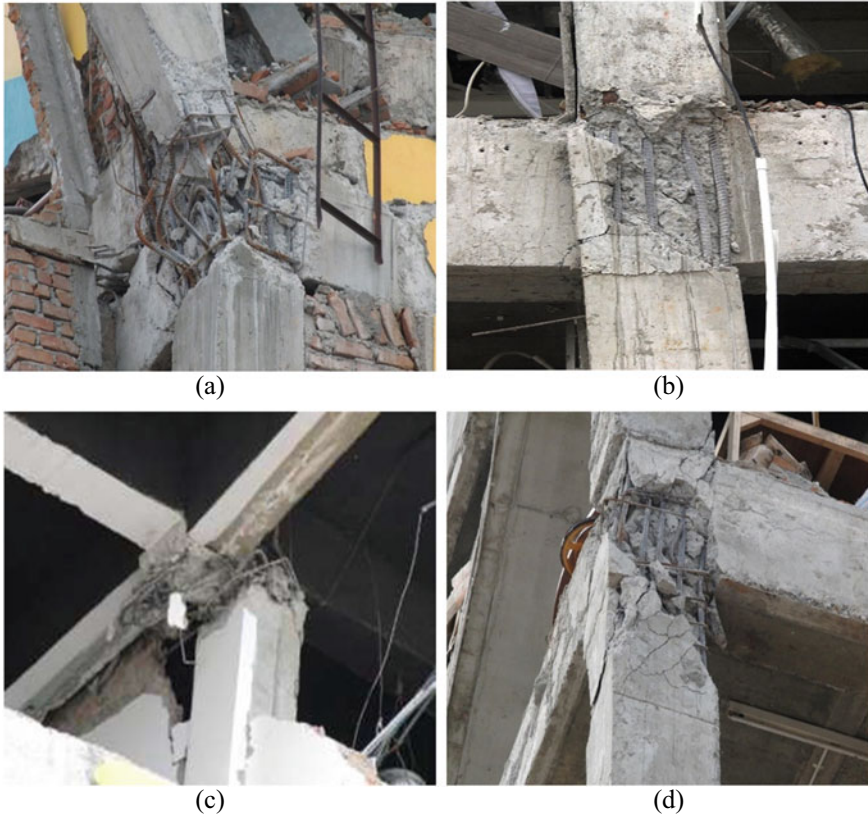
Beam-column joint failure due to lack of confinement bars
